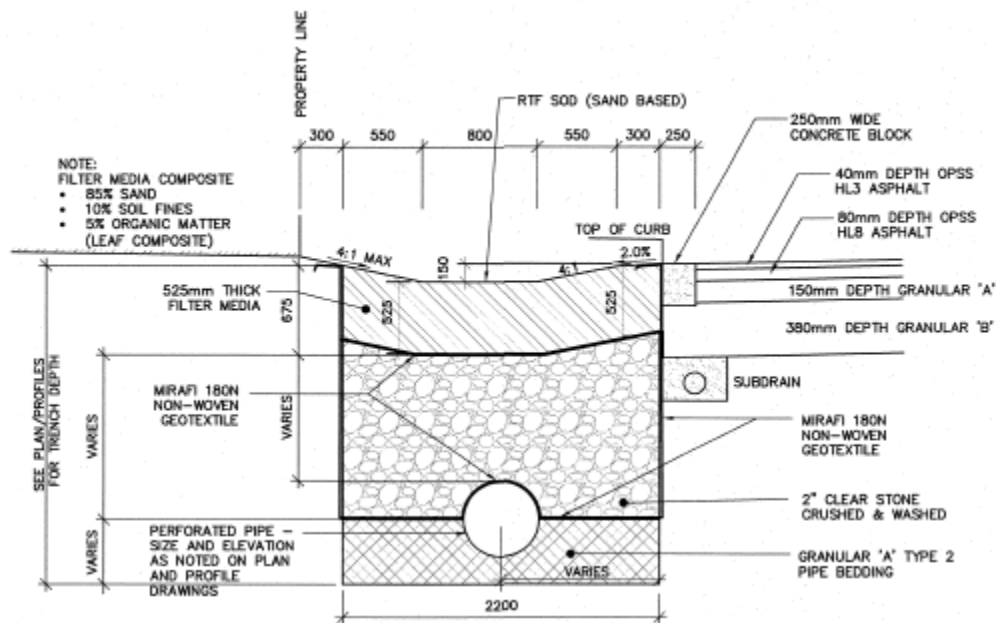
Cross section of Infiltration Trench System (TMIG, 2010)
